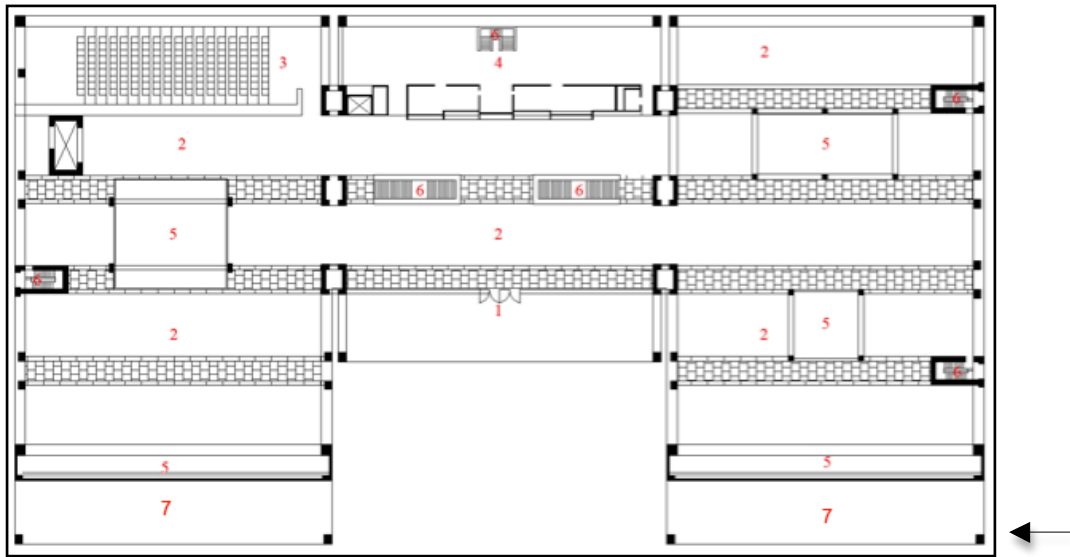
Kimbell Art Museum, Ground Floor Plan (Re-drawn by author)
